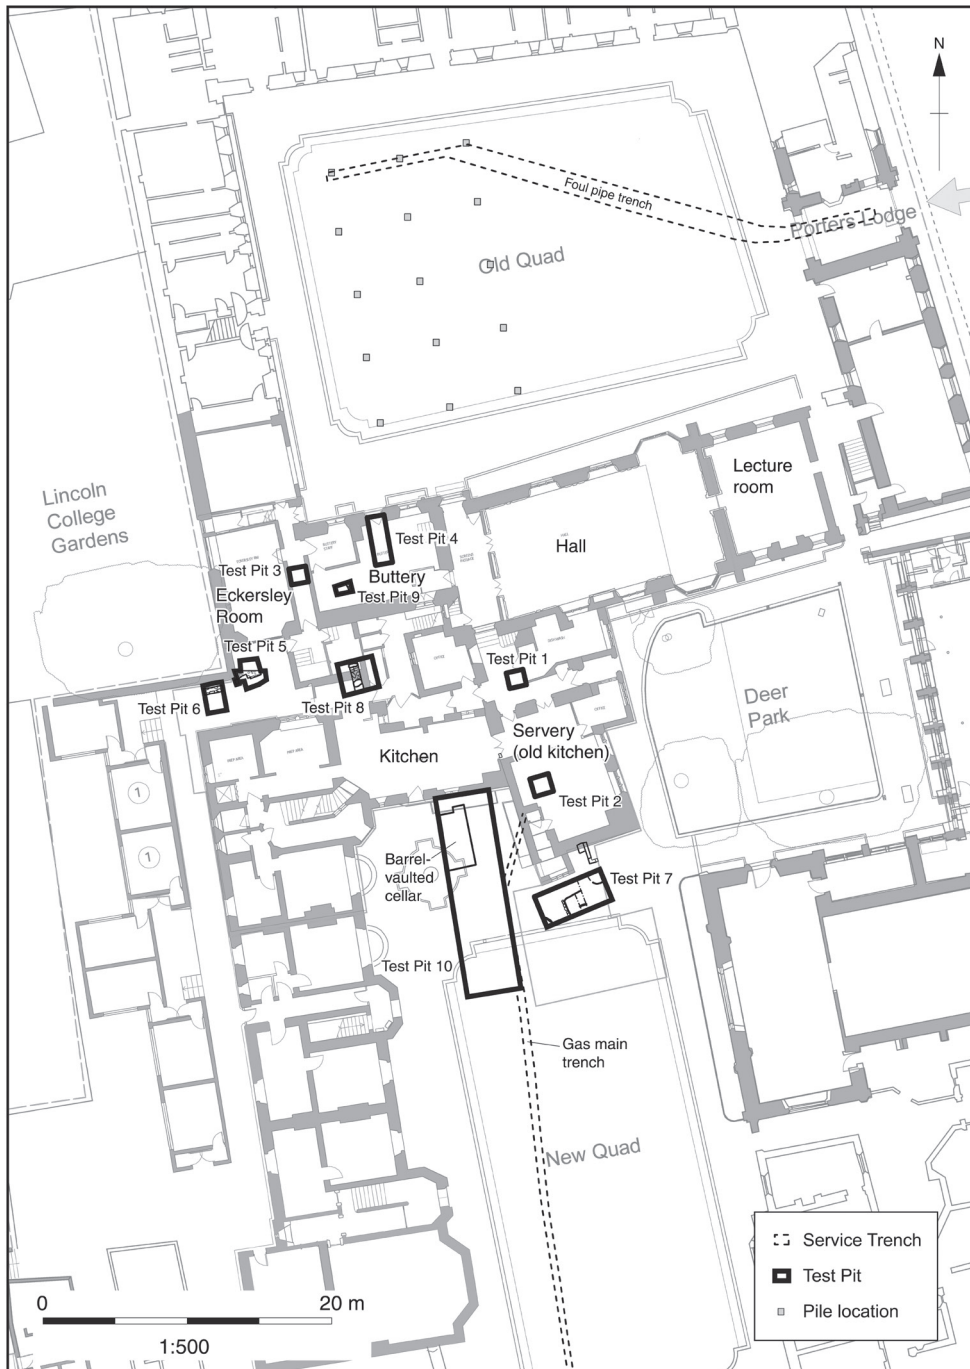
Site plan showing test pits, services trenches and pile locations.
